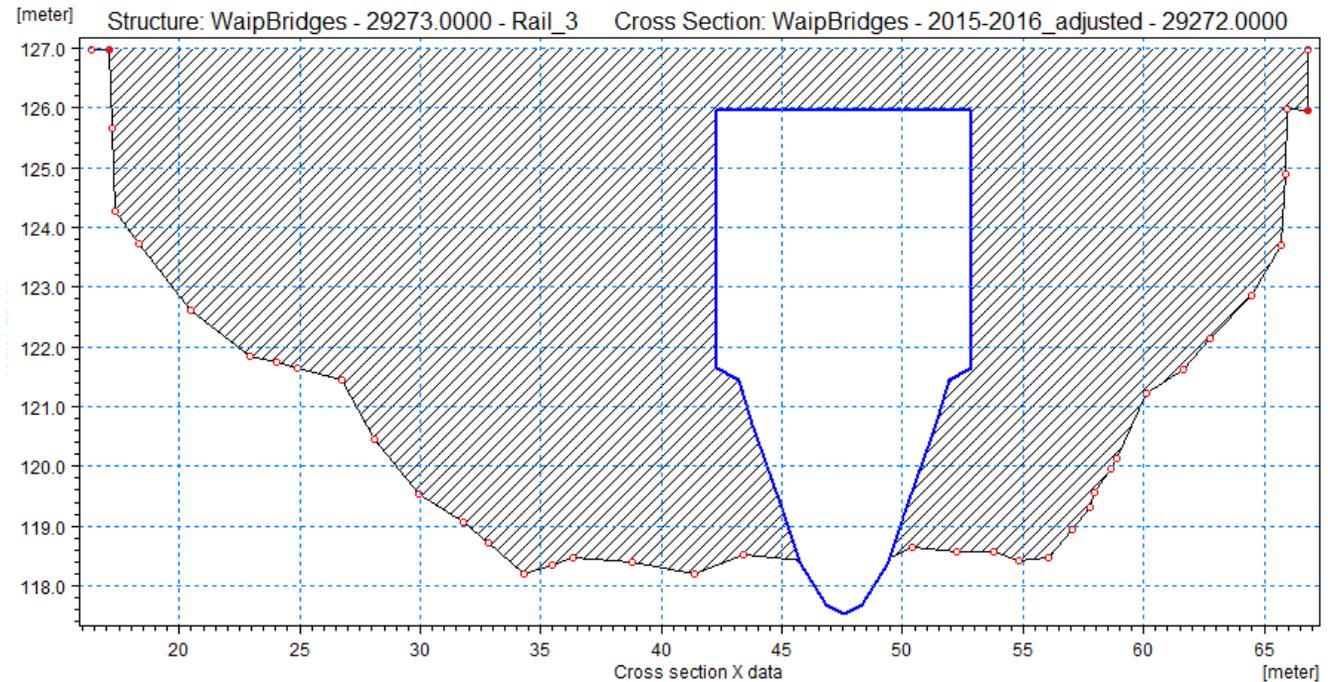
Visualisation of modelled representation of individual rail bridge span.
